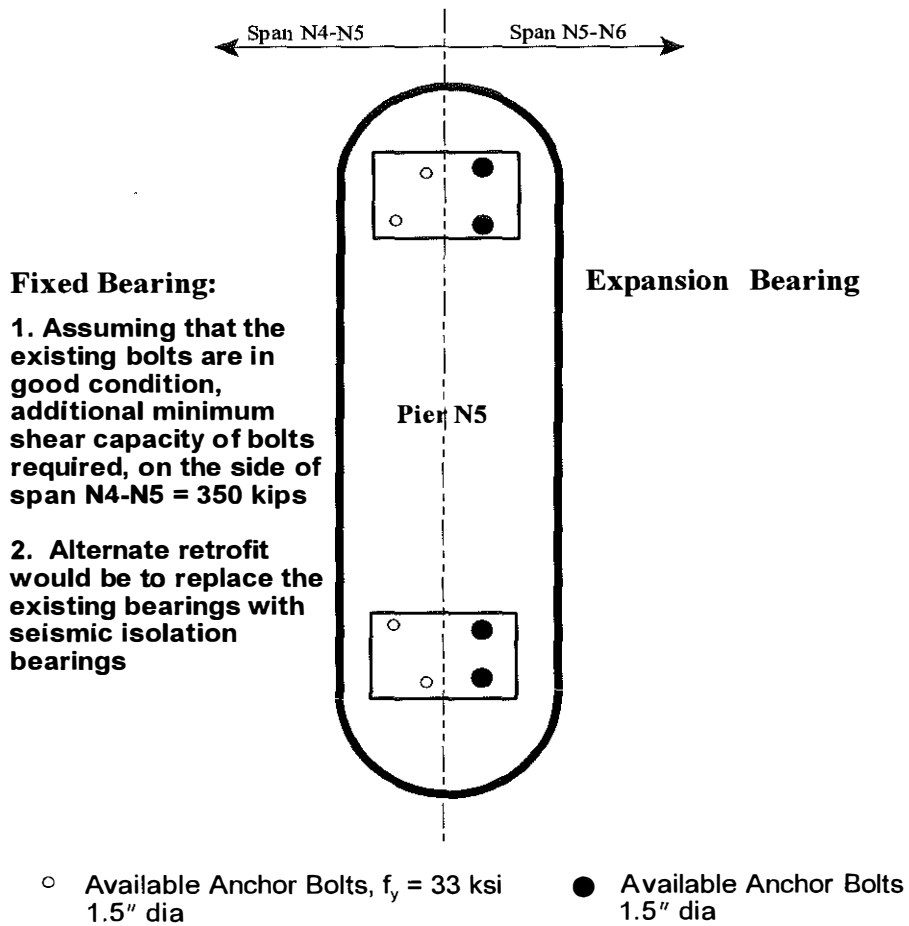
Minimum Required Shear Capacity ( $V_{req}$ ) to be Provided by Additional Anchor Bolts at Bearings of Pier N5 on the Evansville, IN Approach of the US41 Northbound Bridge
